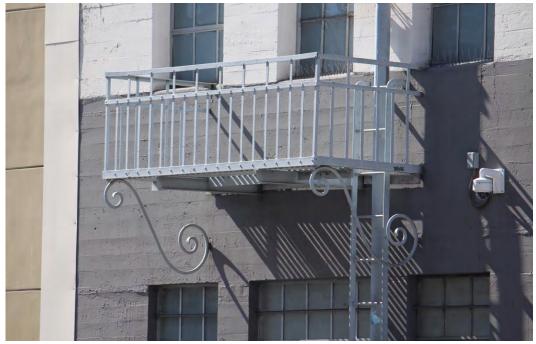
One of two fire escape balconies on the east facade with scrolled bracket supports. These will be incorporated into the rehabilitated facade.
